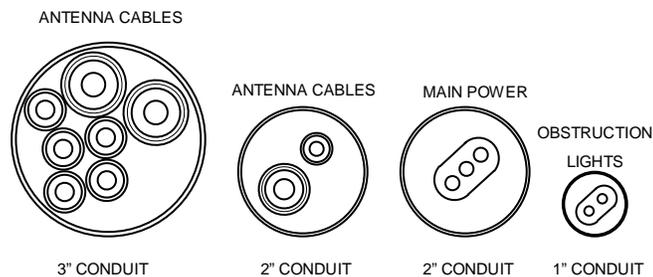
Distribution of Cables in Outside Junction Box Openings to Trench
